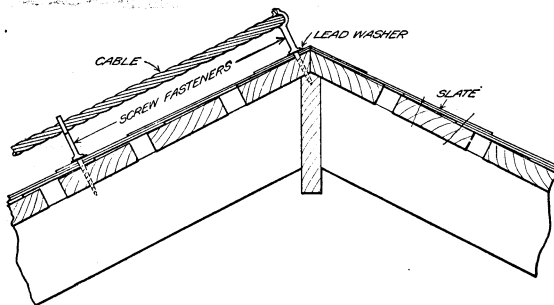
Conductor fasteners for use on shingle, metal, and slate roofs.
